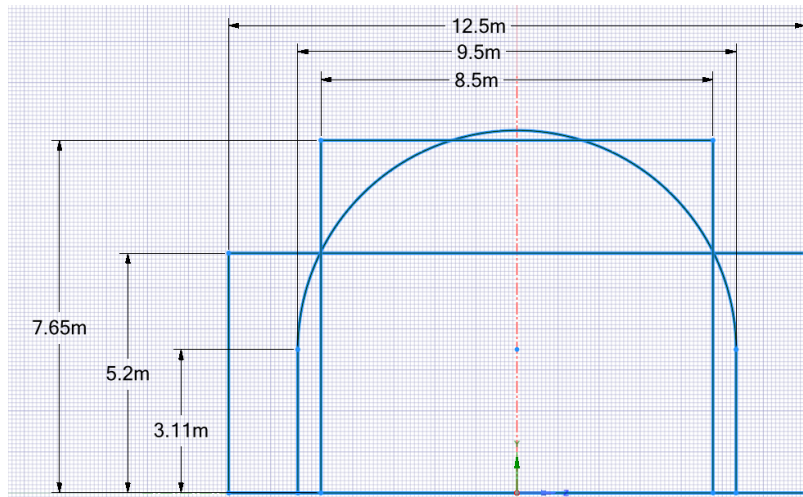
Tunnel cross section geometric parameters for three types of cross section as flat, tall and arched ceiling
